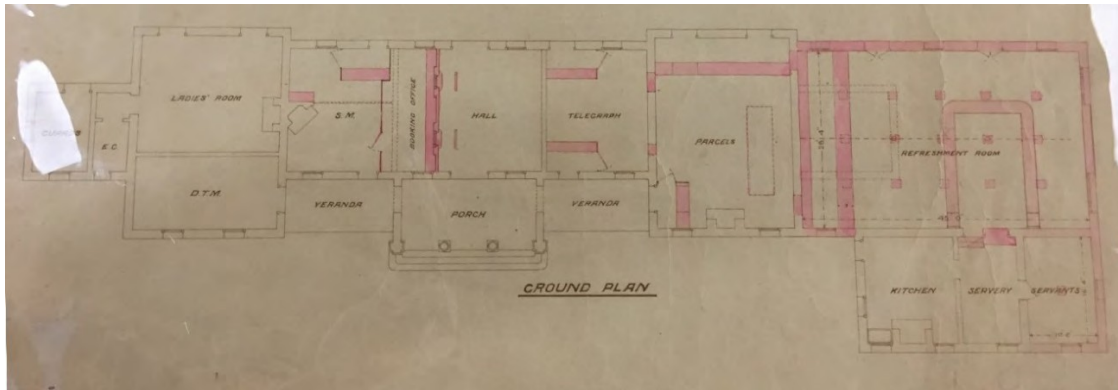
Alterations to Warwick passenger station - floor plans – new additions are shown in pink. Drawing dated 20.2.1912. Source: QSA Series 17692 Plans of Queensland Railway Station Buildings etc., Item ID 120966
